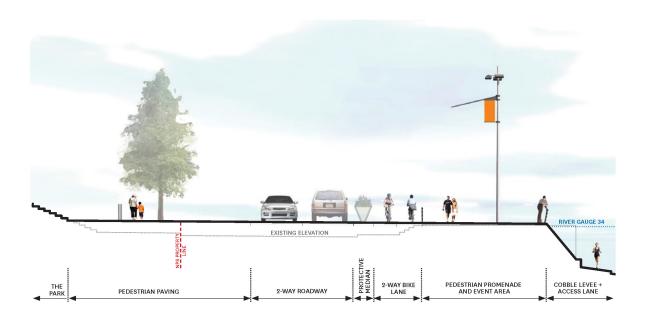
Central Riverfront Leonor K. Sullivan Concept Section (Source: MVVA)
